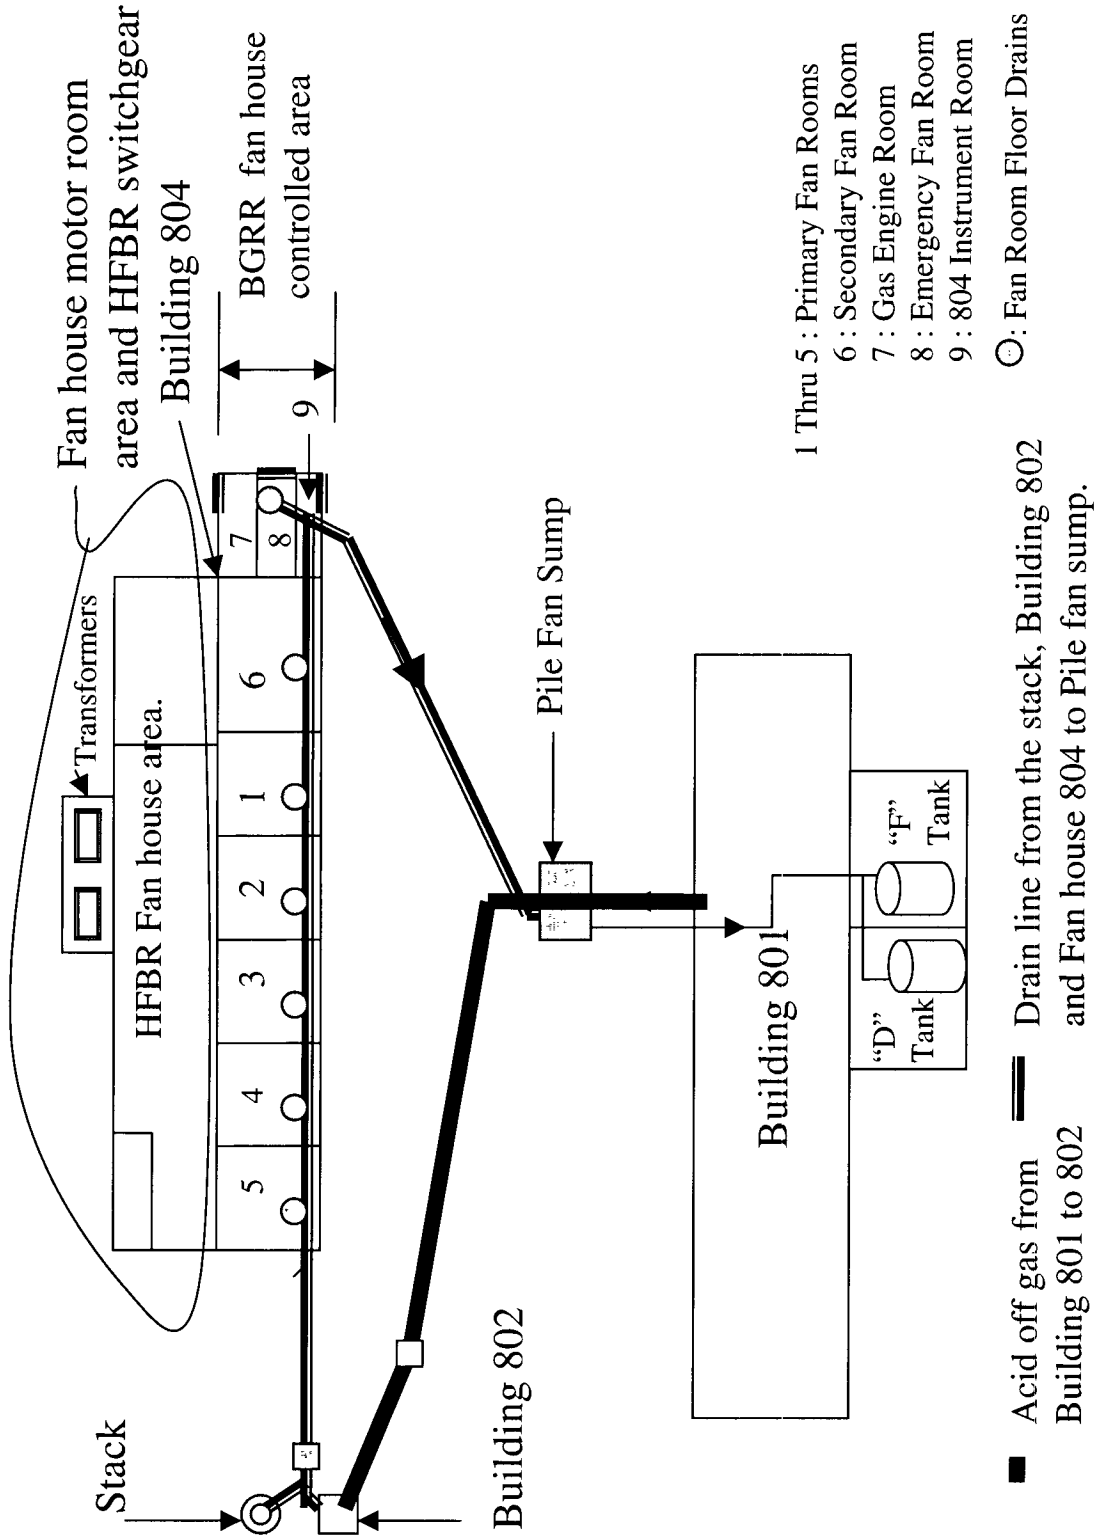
BGRR Fan House Floor Drain System to Pile Fan Sump, Building 704
